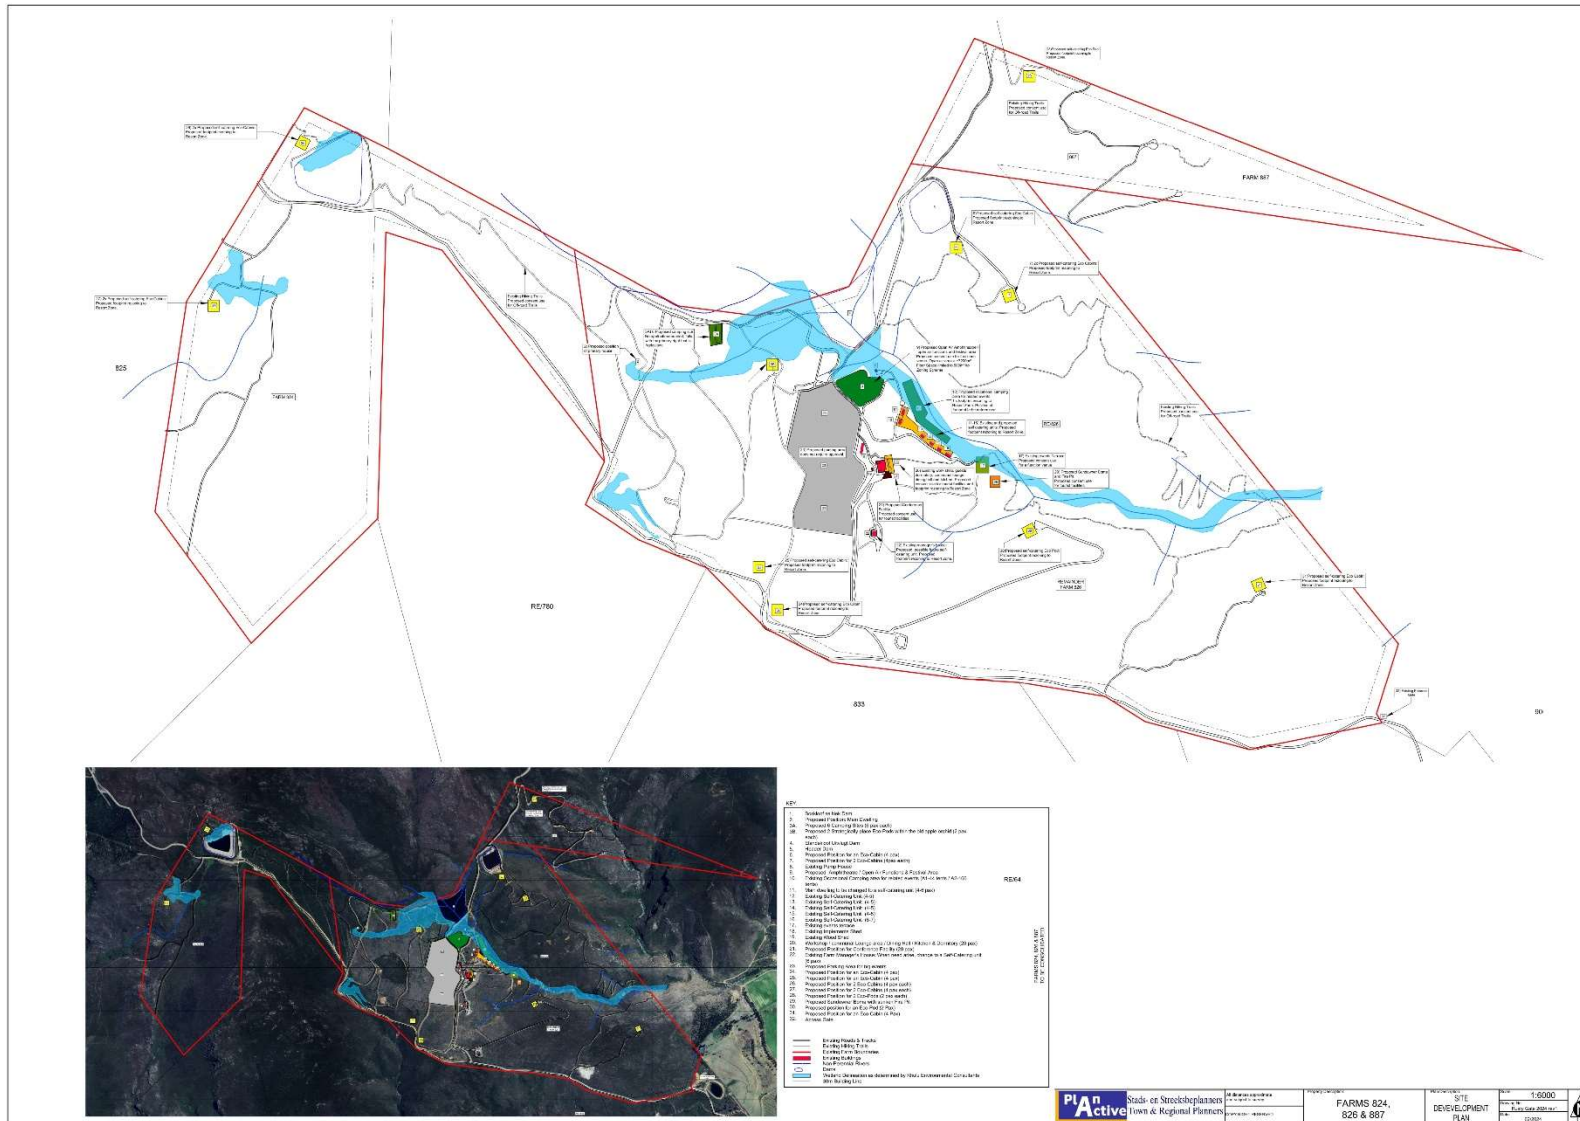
Site Development Plan showing the location of the proposed new tourist accommodation structures.
